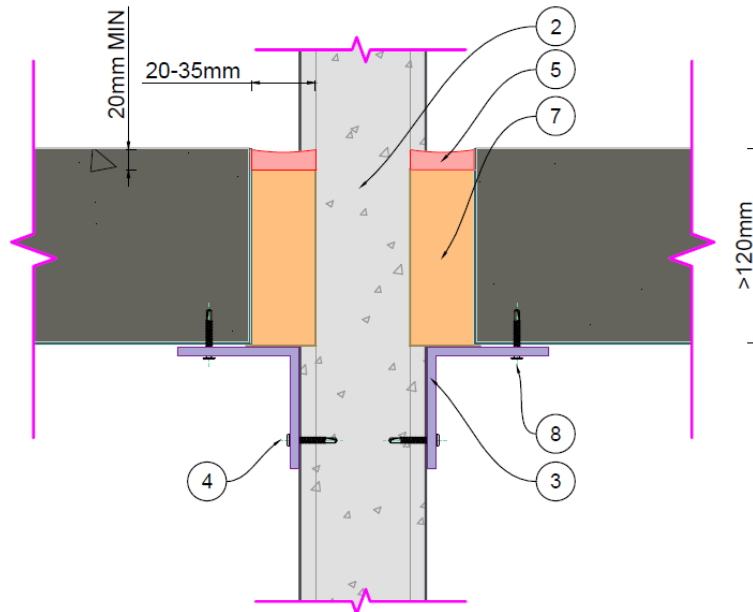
Wall-to-stair Joint (20-35 mm gap)
